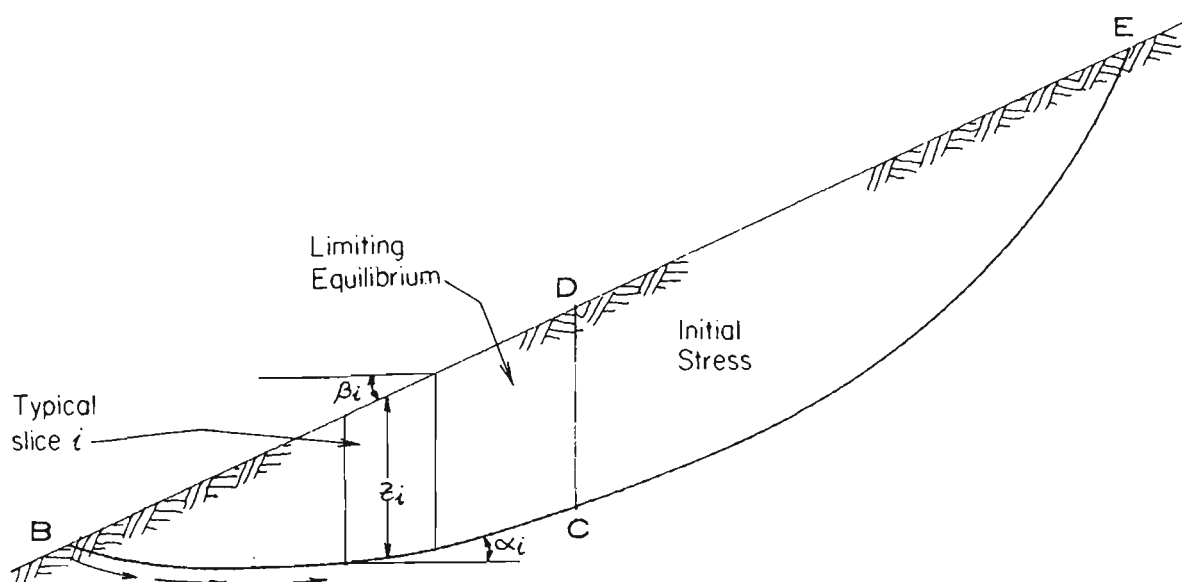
Typical Slope Cross-section showing Propagation of Failure.
